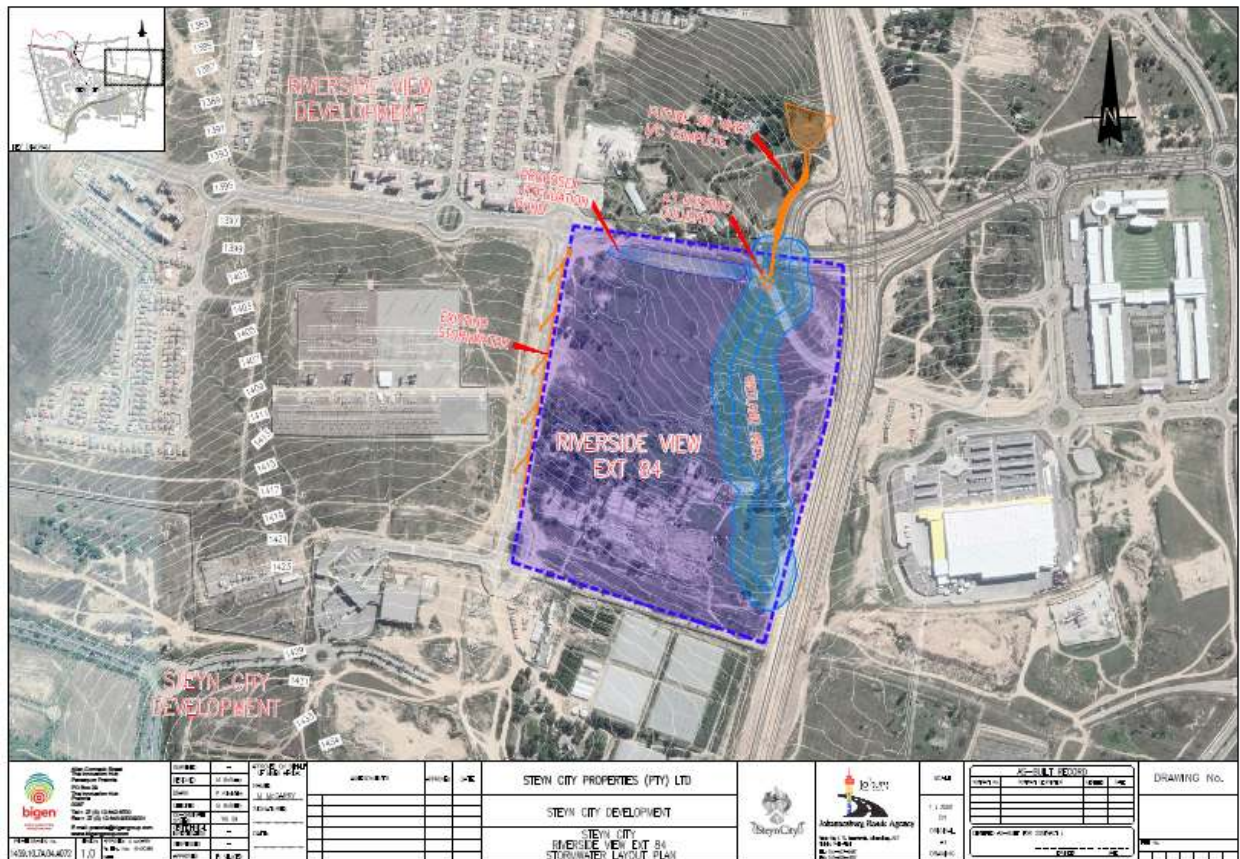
Alternative - Attenuation Pond to the north of the site
